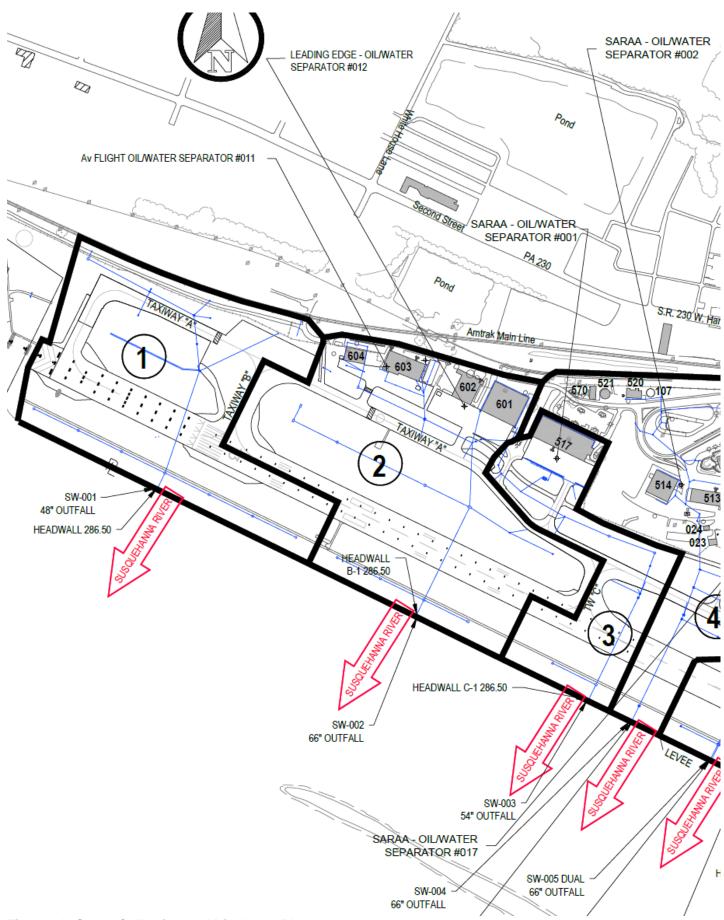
A. Storm Collection and Discharge Plan. Zoomed in view of the Storm Collection and Discharge Plan.
